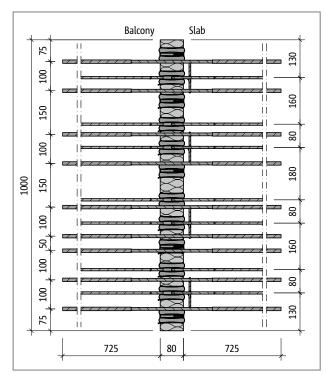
Schöck Isokorb® T type K-M8-V1: Product layout
